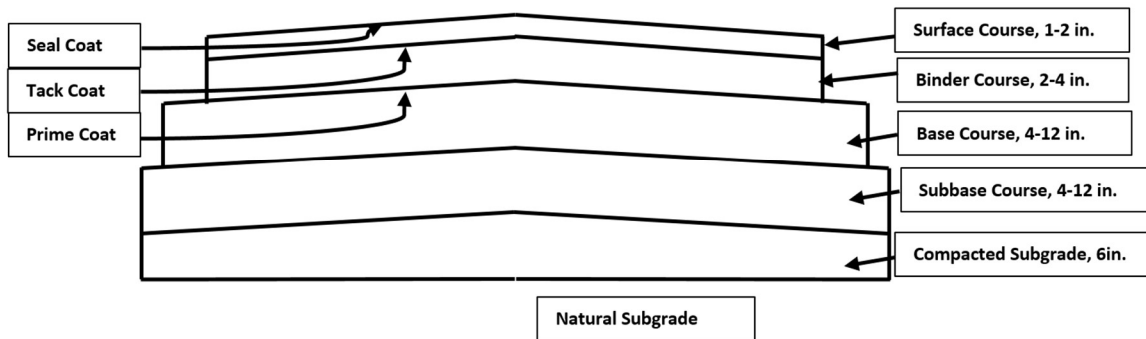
1 Typical cross-section of Conventional flexible pavement (Huang, 2004)
